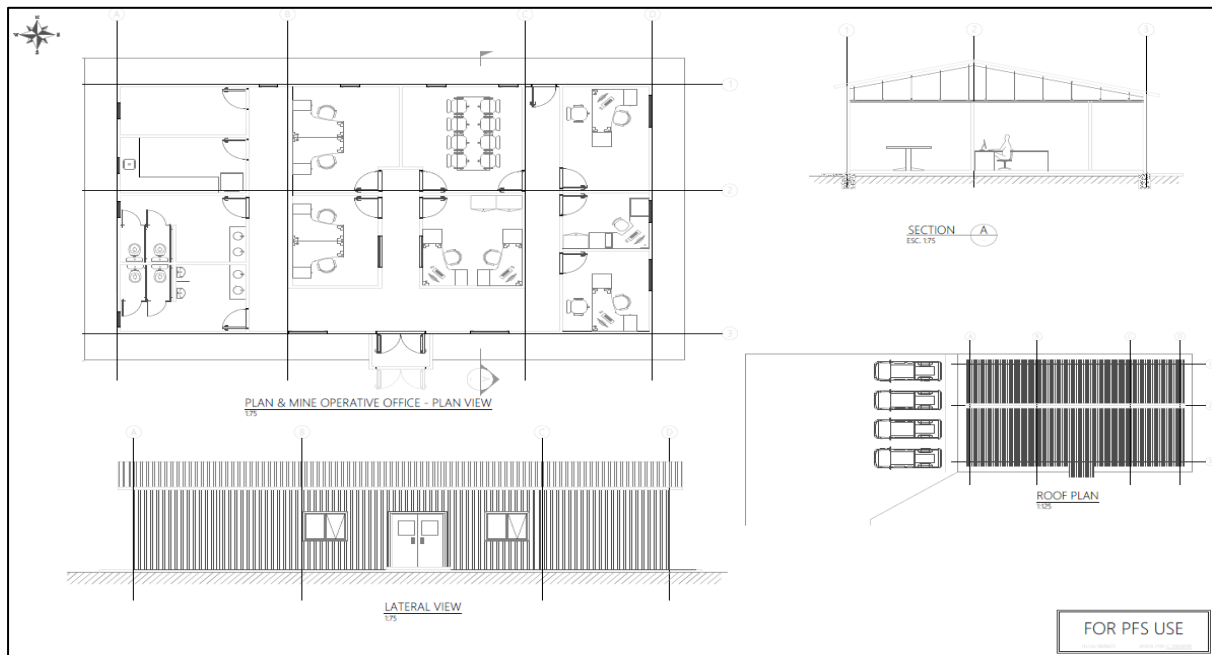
Typical lay-out of work front offices for mine and process plant staff
